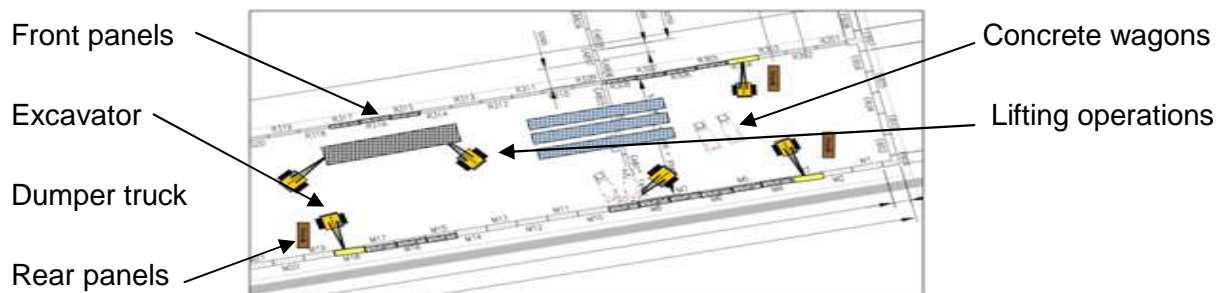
Typical plan view of a section of the construction site indicating other key activities
